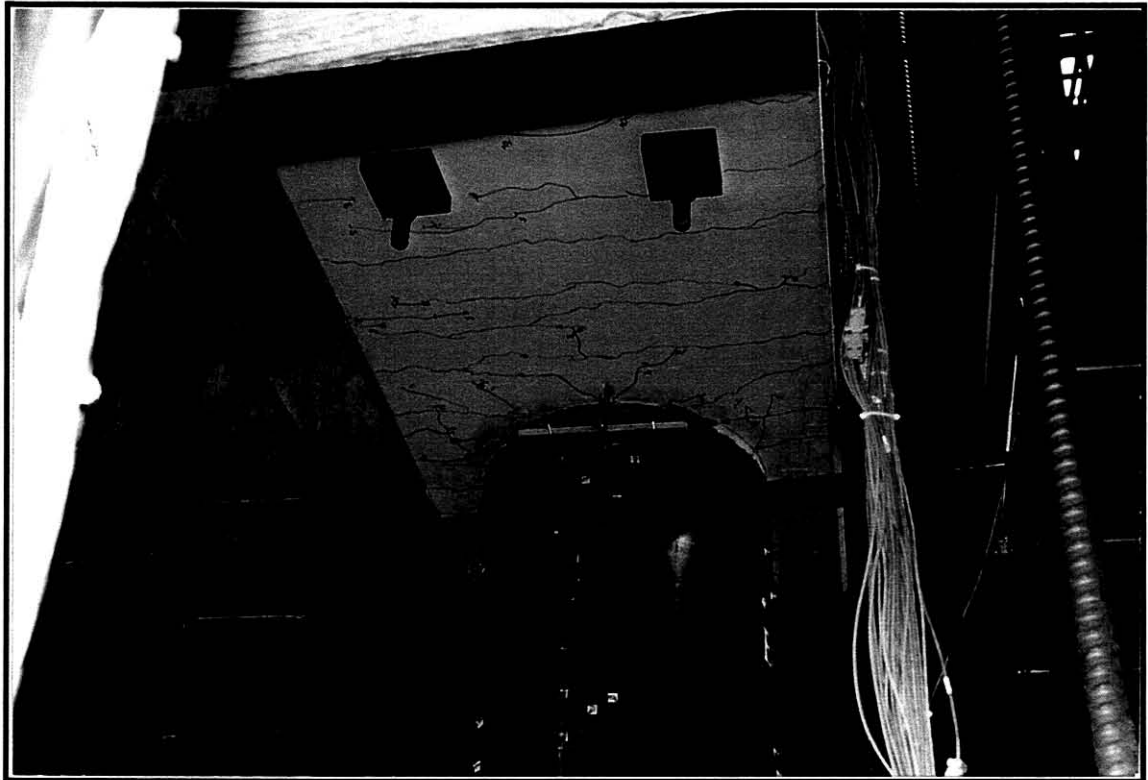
Spalling of Cover Concrete and Initiation of Radial Cracks on the Bottom Beam Surface - Interior Column *IC
